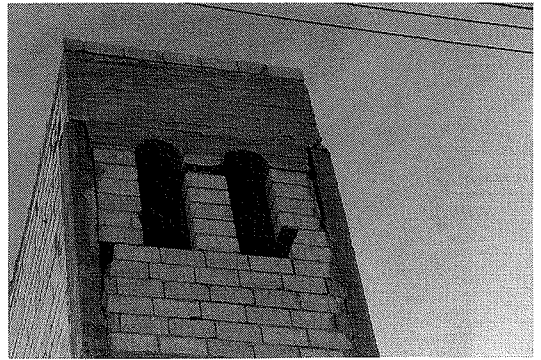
Construction of poor quality. The columns were stopped one meter before the concrete slab, and the highest portion of the wall was made from plain concrete supported on hollow block pedestals.
